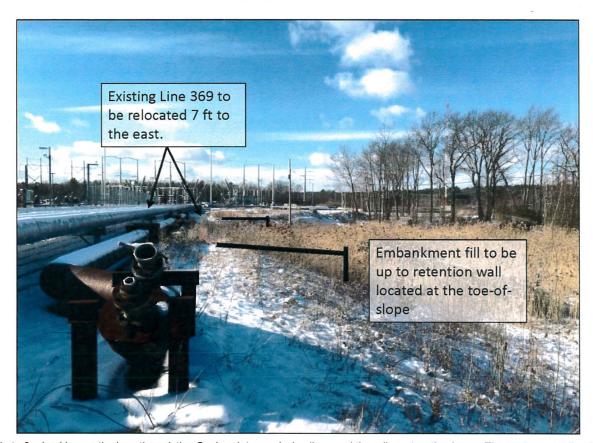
Looking north along the existing Seabrook transmission lines and the adjacent wetland area. The easternmost line 369 will be relocated seven feet east on the existing filled embankment. A retaining wall is planned to be installed between the new location of line 369 and the wetland area located to the right of the photograph. All work will be limited to upland areas and no direct impacts will occur to the adjacent wetland.
